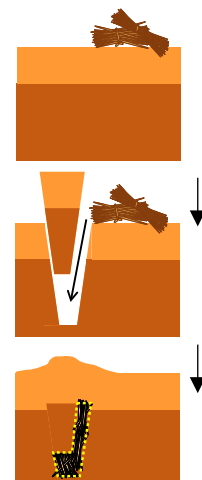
Method of constructing a shallow subsurface drainage system using Cut-Soiler
